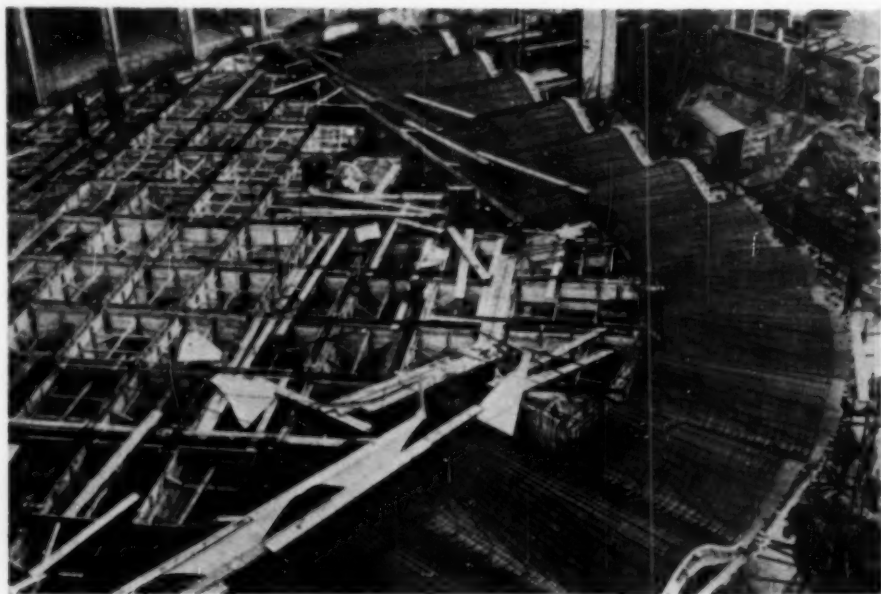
Concourse Roof of Omnibus Station and Canopy During Construction.
